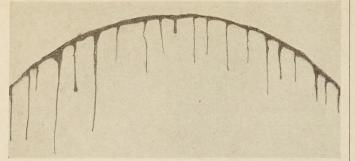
TYPICAL CONDITION OF FLOW FROM CRESTS OF CORRUGATIONS IN THE TOP QUARTER INSIDE THE CULVERT PIPE.
